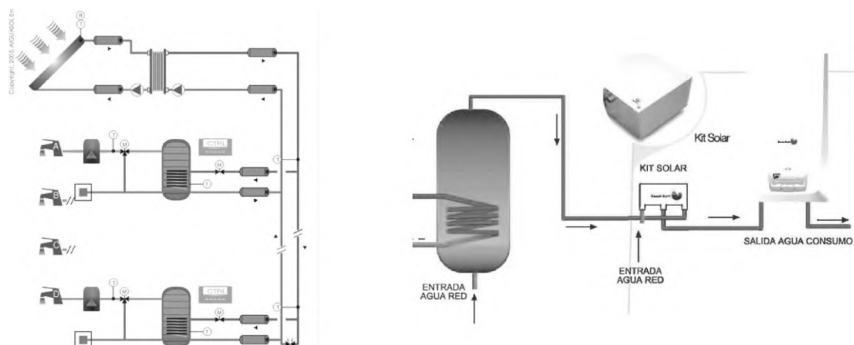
Typical Spanish hydraulic layout with decentralized back-up heating
